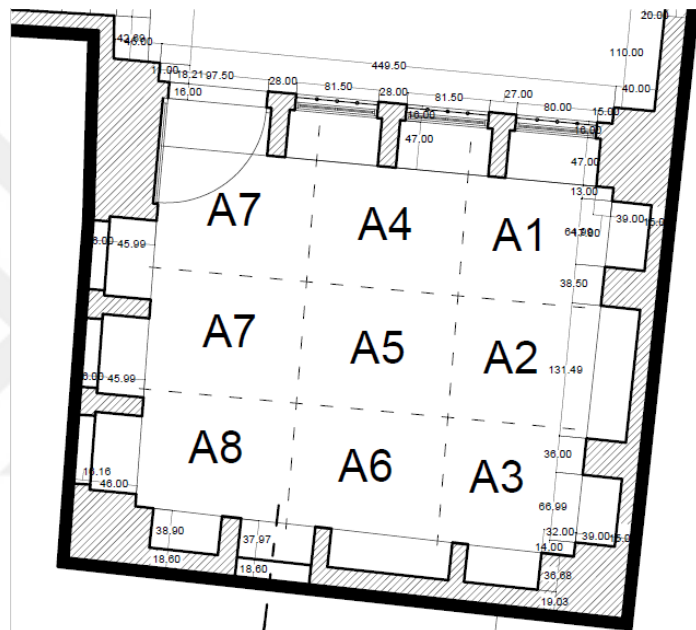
G9 Room Plan (TEMA 2008, Organized by Author)
